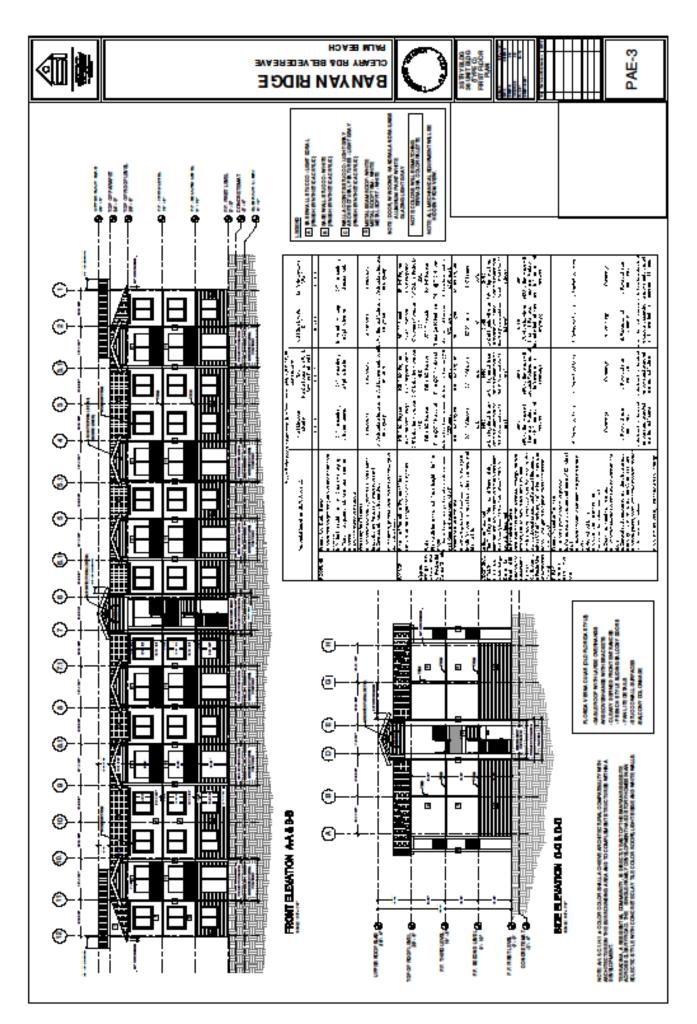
Preliminary Architectural Elevations dated August 13, 2018. (Sheet 1)
